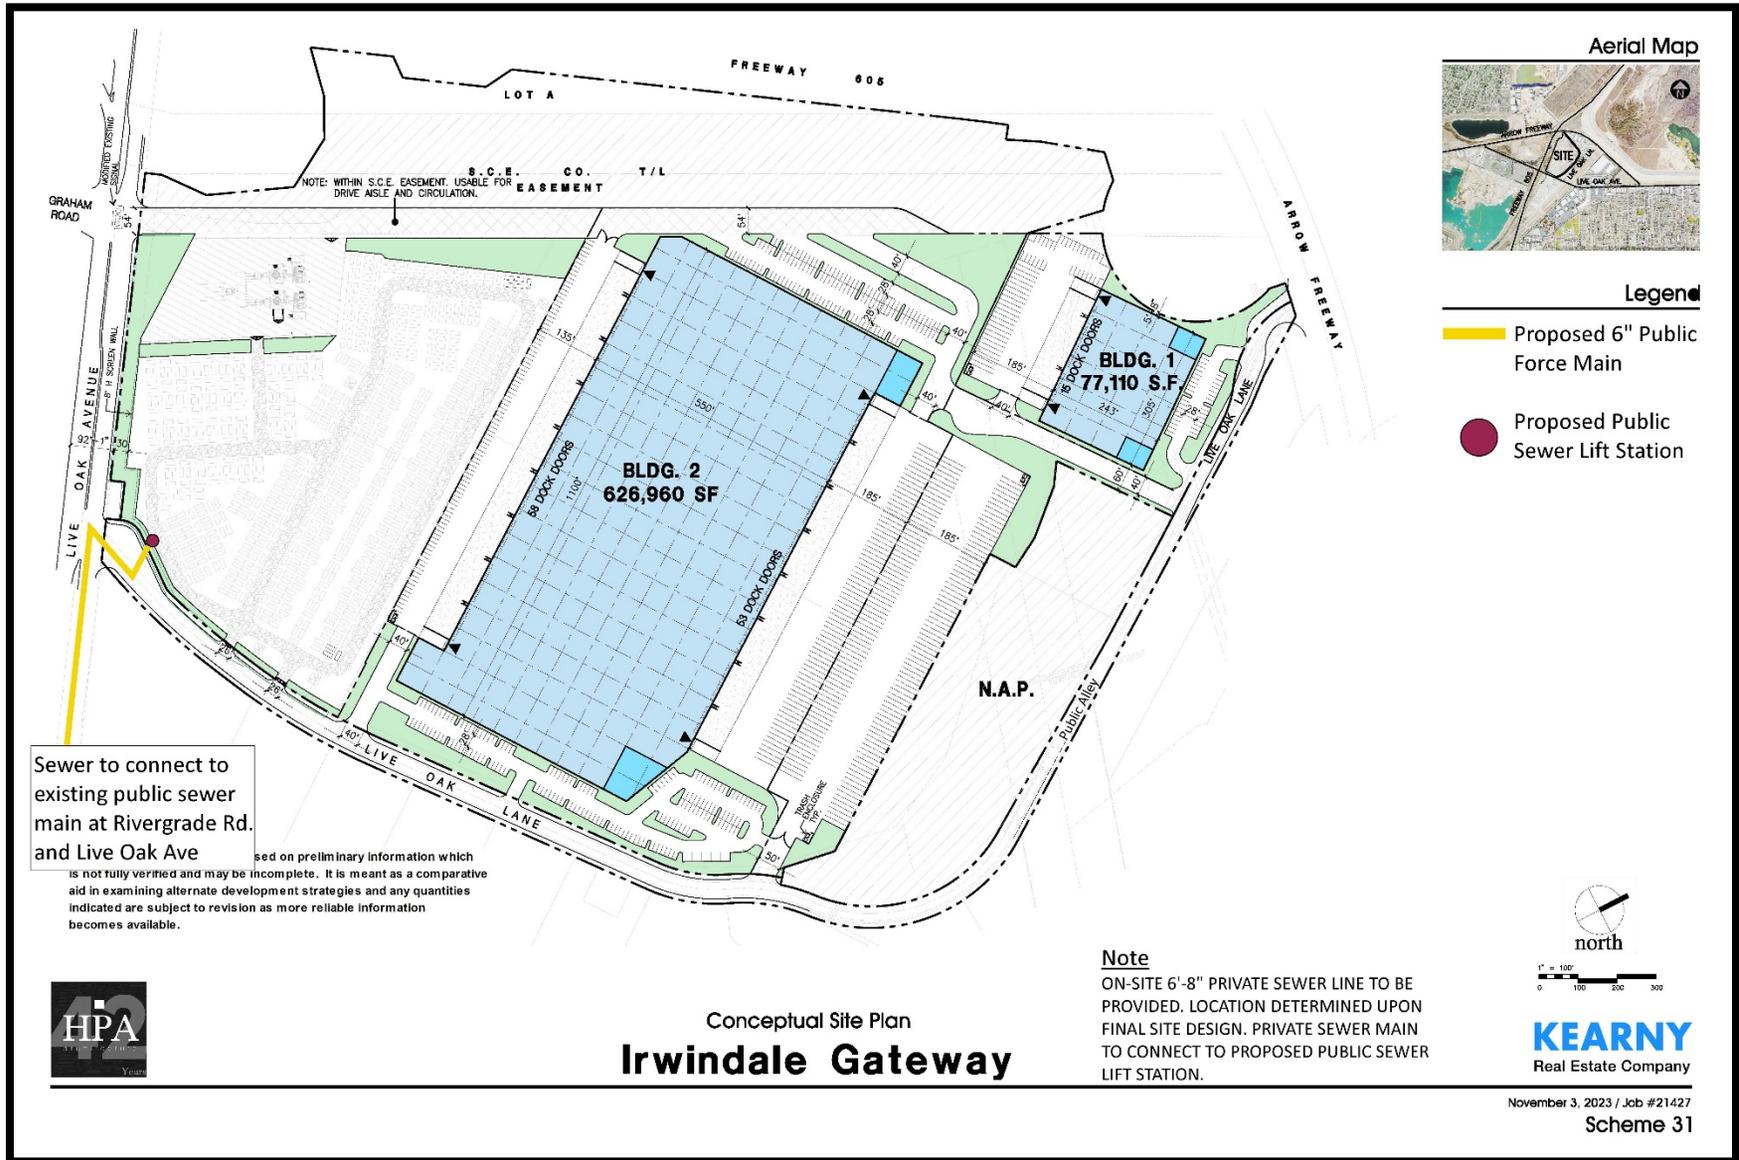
CONCEPTUAL SEWER PLAN WITH BESS
